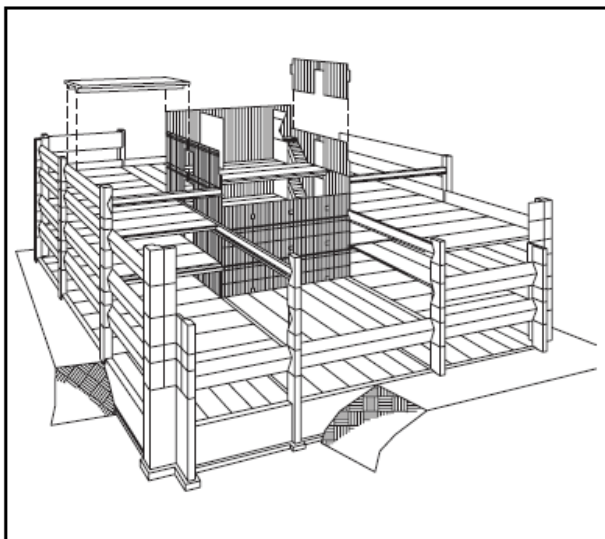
Interior Shear Wall System as shown and defined by the PCI Handbook, 6th Edition
